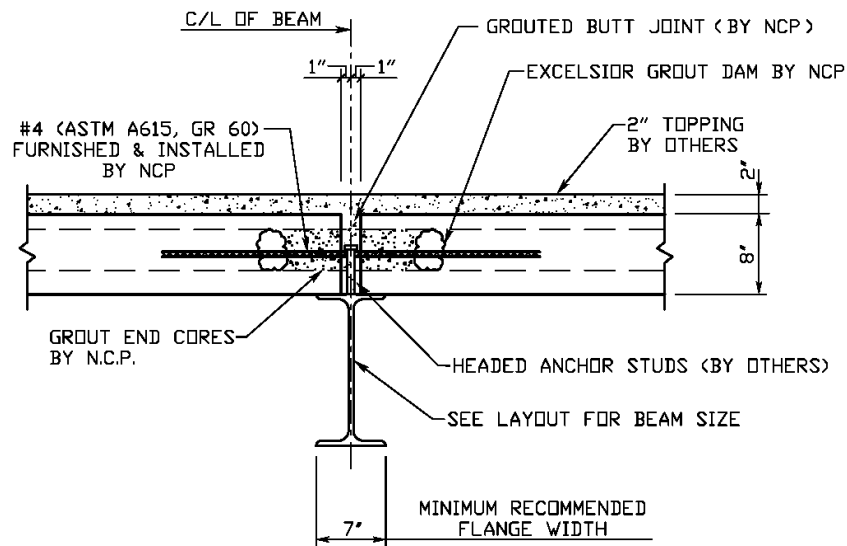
Nitterhouse Detail of Hollow Core Plank Bearing on Steel Beam
